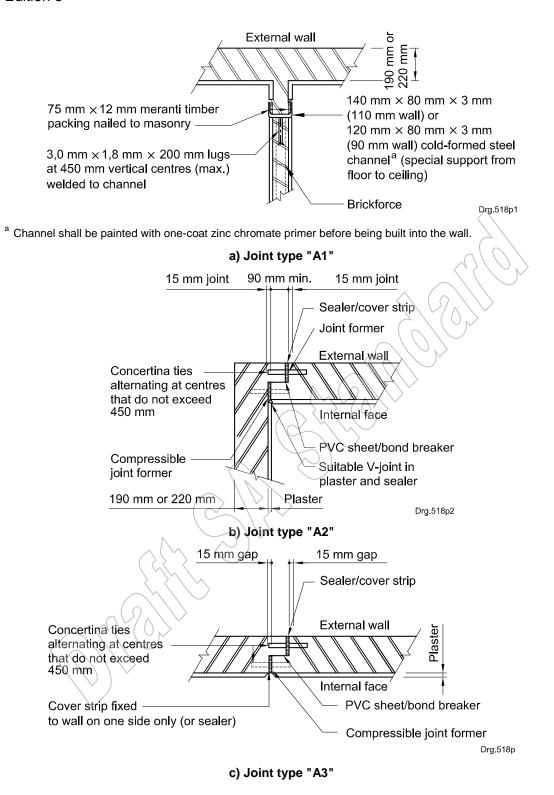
Full movement joint details for collar-jointed walls (190/220 solid masonry units)
